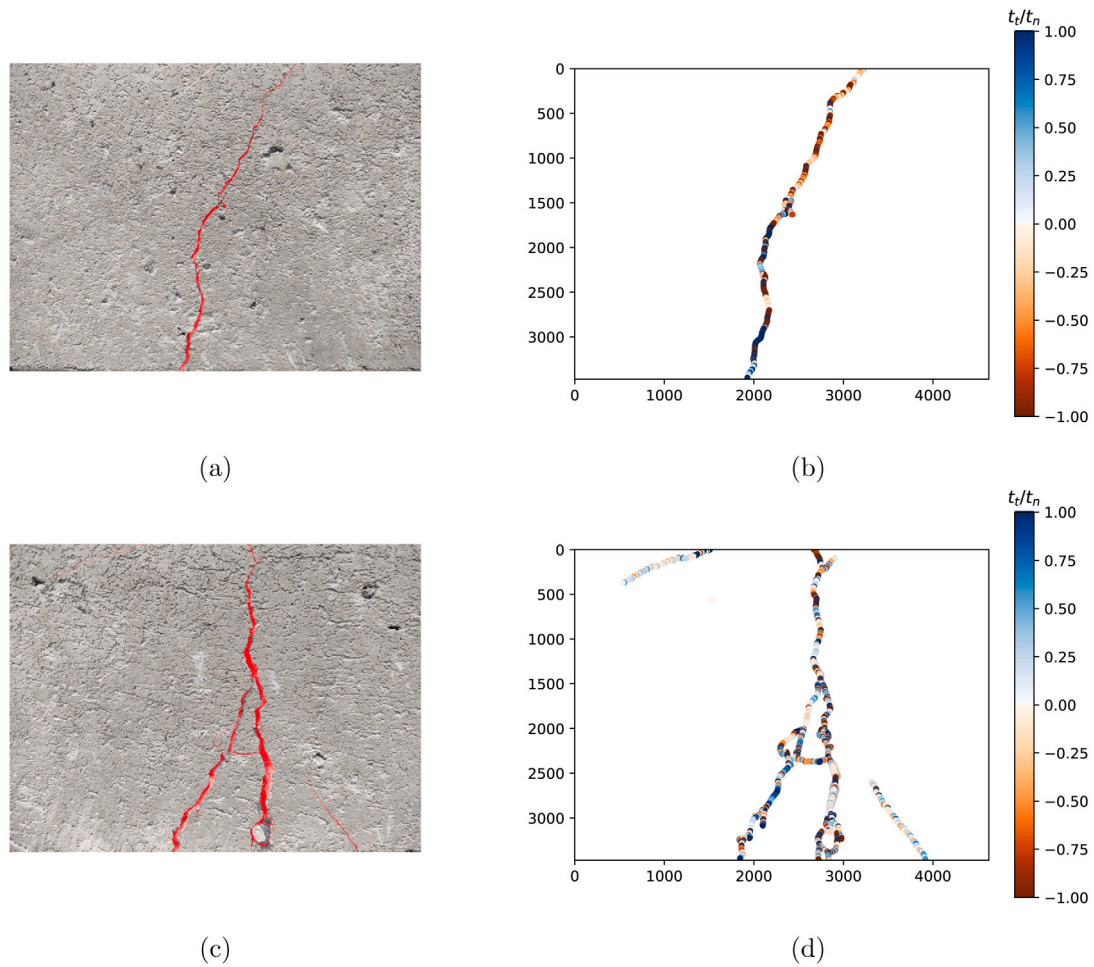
Crack kinematics for damaged beam—Binary-mask-based pipeline segmenting crack: (a) segmented crack overlaid over beam crack pattern 1, (b) crack kinematics—relation t_i/t_n for crack pattern 1, (c) segmented crack overlaid over beam crack pattern 2 and (d) crack kinematics—relation t_i/t_n for crack pattern 1.
